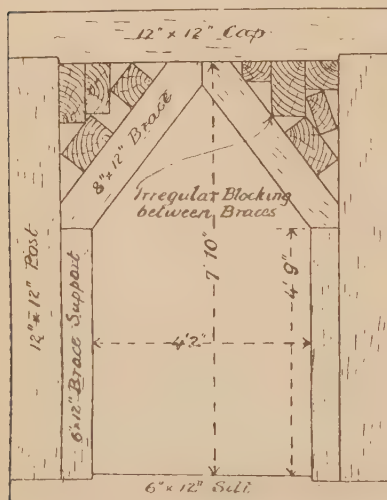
Angle-braced drive-timbering, Ruth Mine, Nevada, U.S.A.
